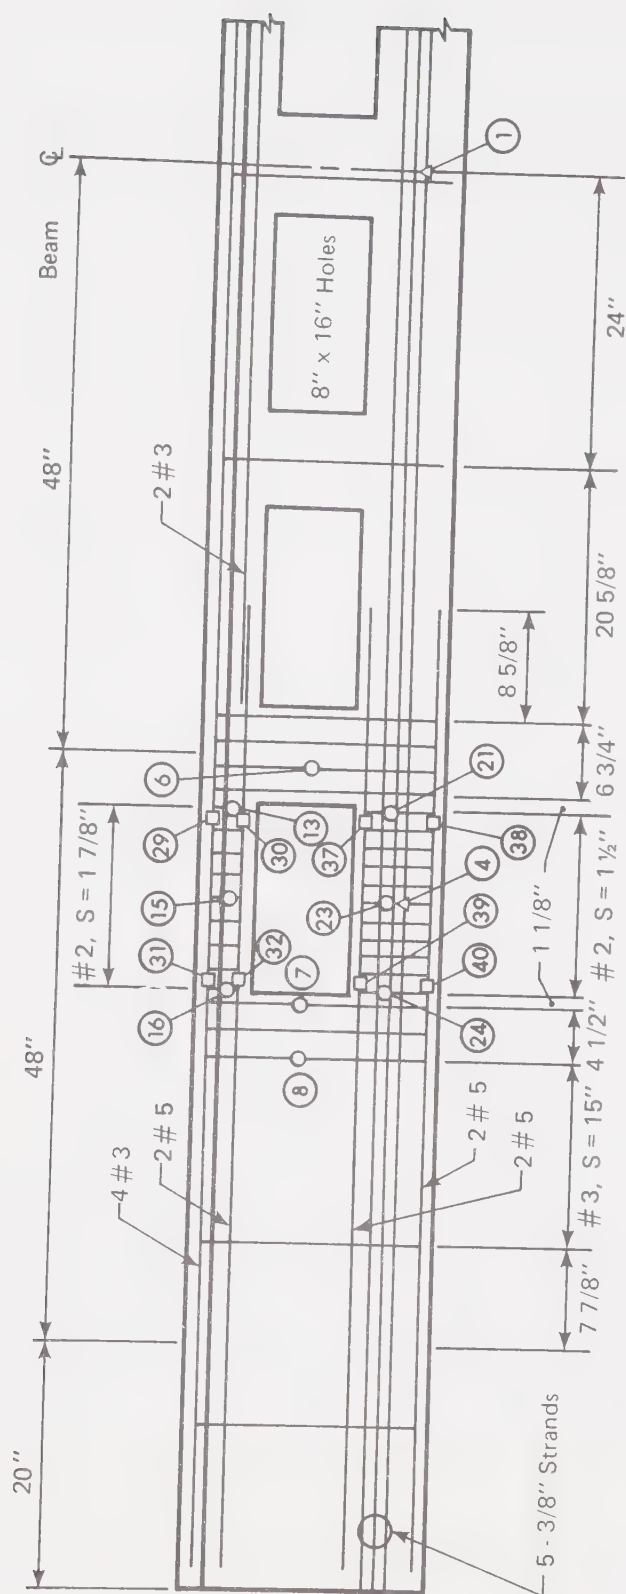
Reinforcement Details and Strain Gage Locations for Beam 18-16-4
